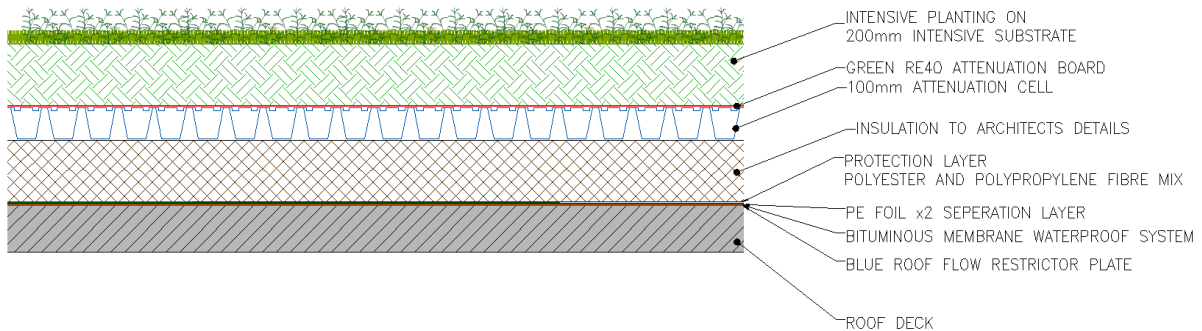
Typical Intensive Green/ Blue Roof Landscaping
